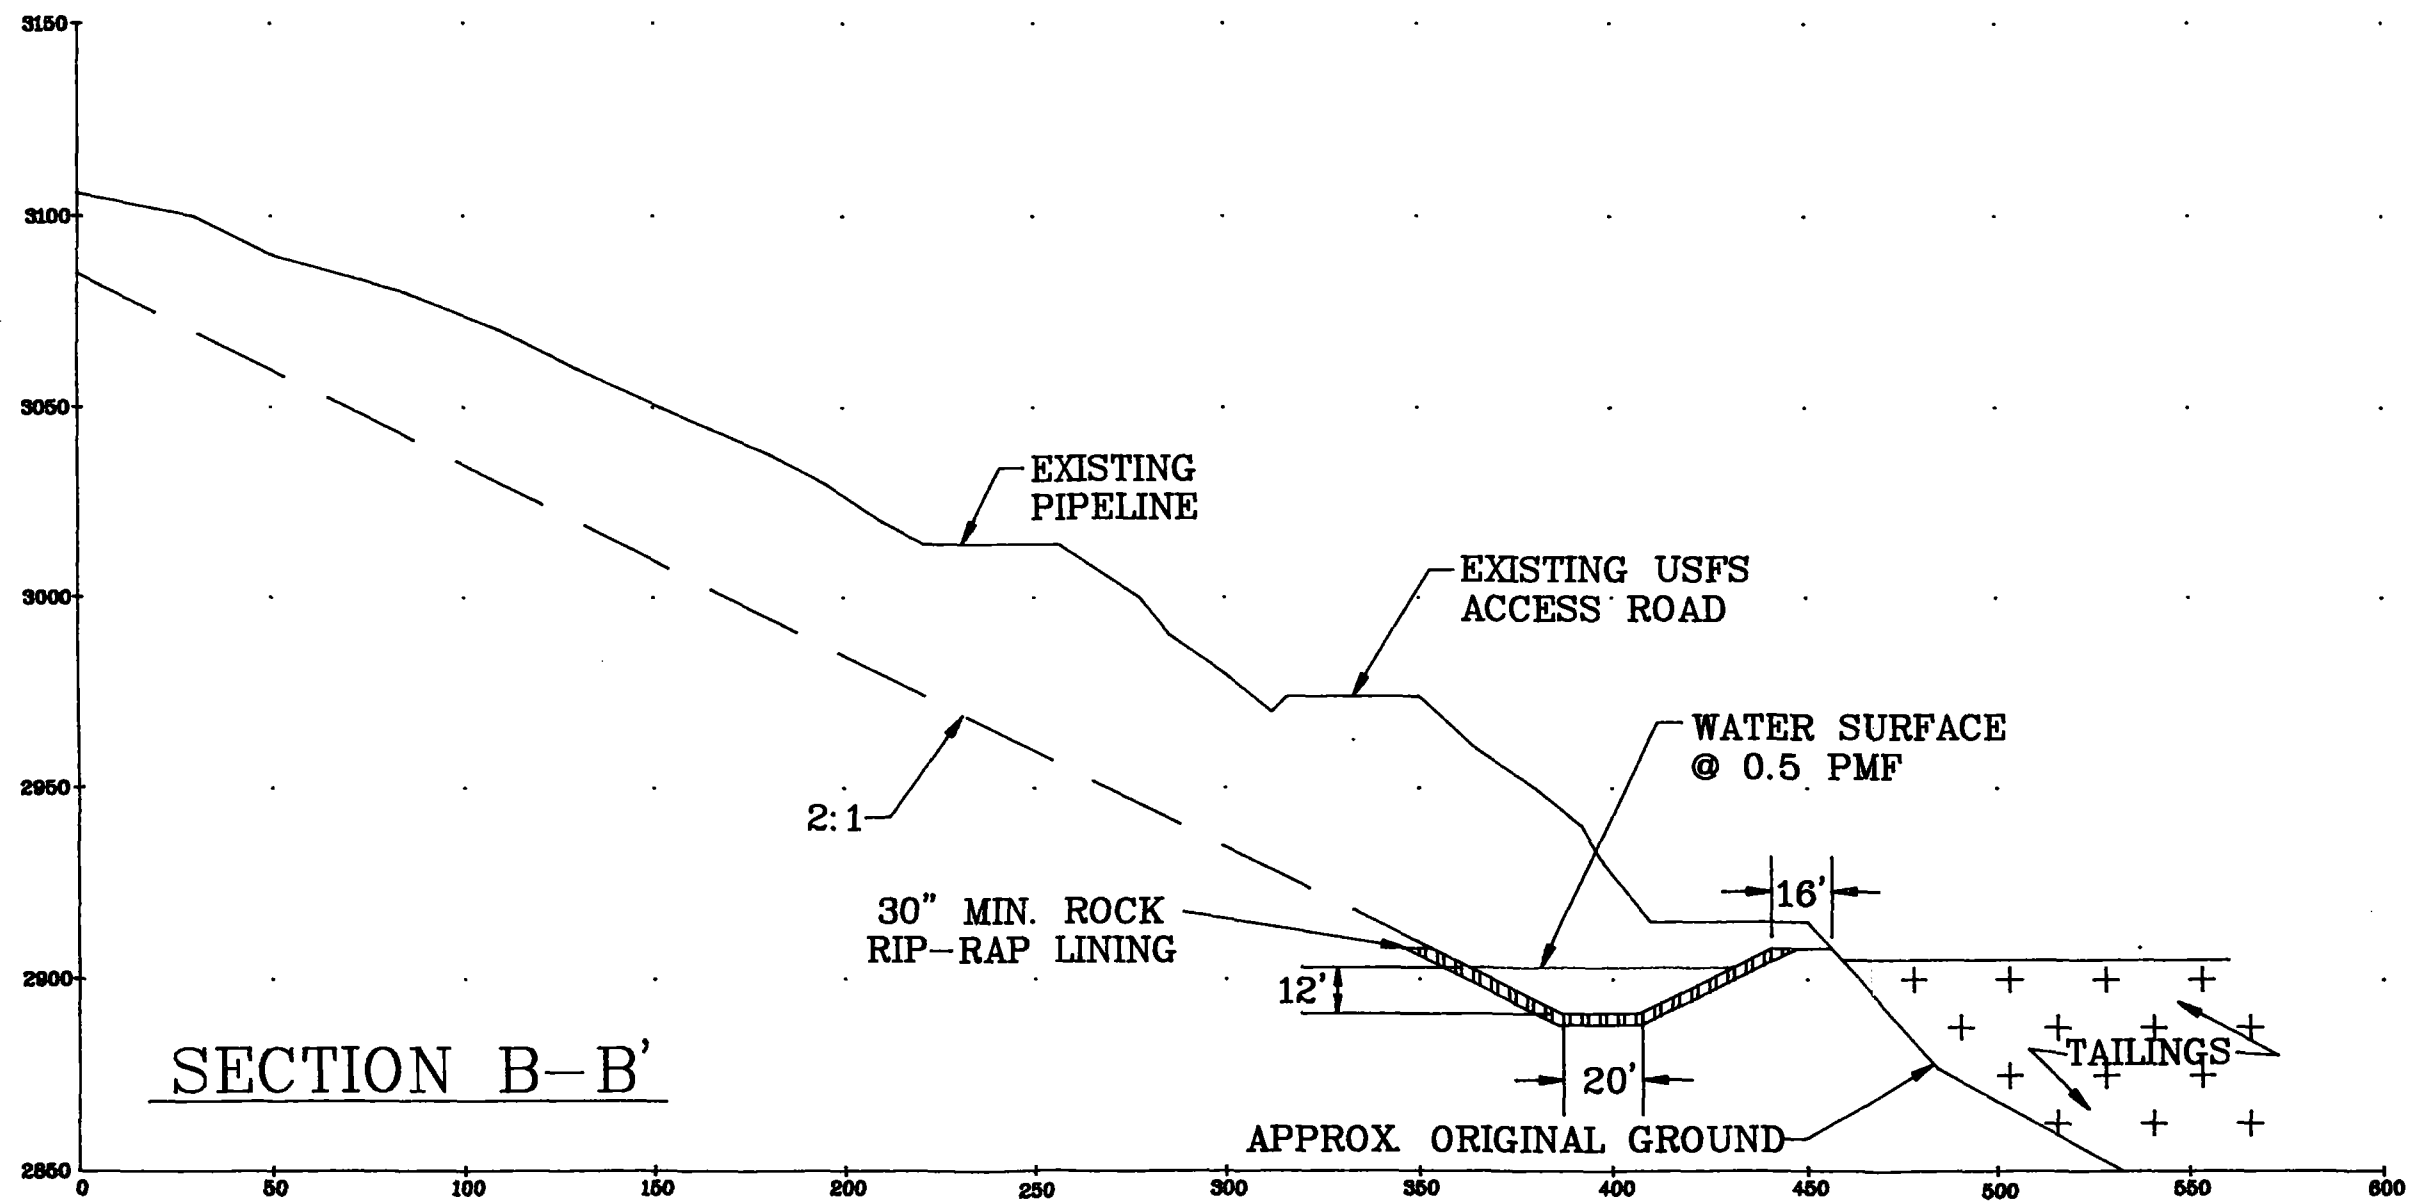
Typical cross-section of west diversion channel showing limits of excavation.
